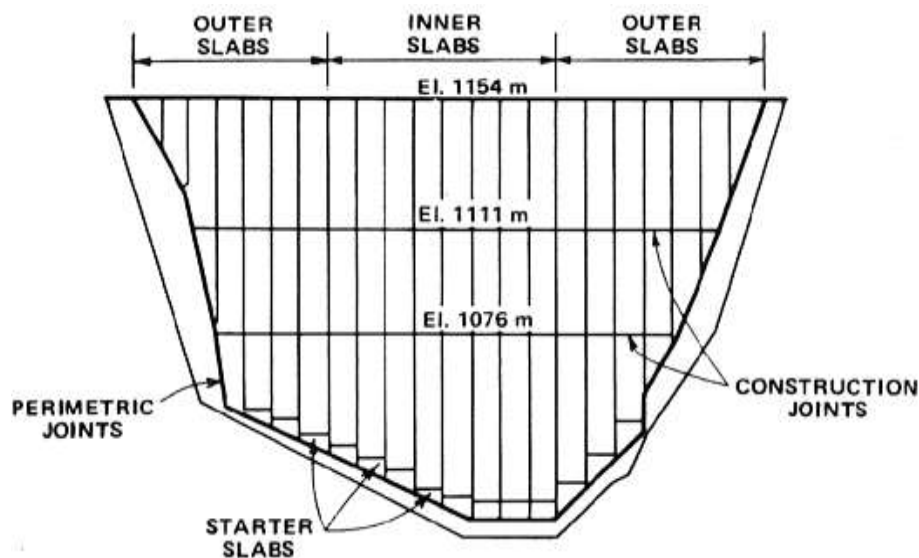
Design of concrete facing and joint arrangement (Thomas 1988, p. 379).
